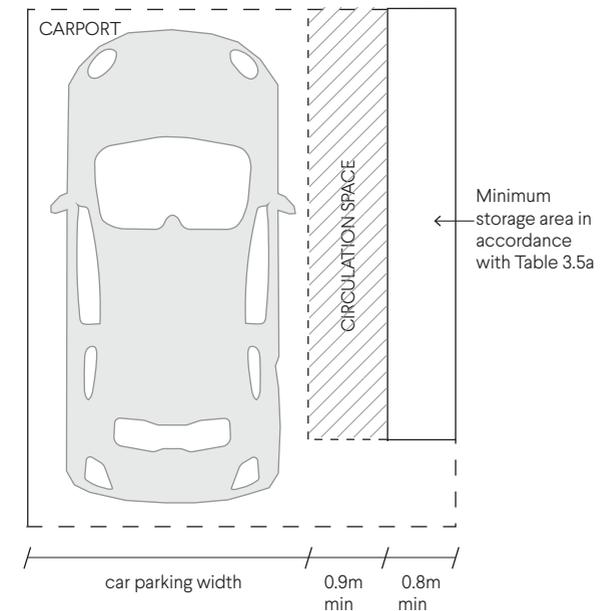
Minimum storage dimensions with adjacent circulation space
